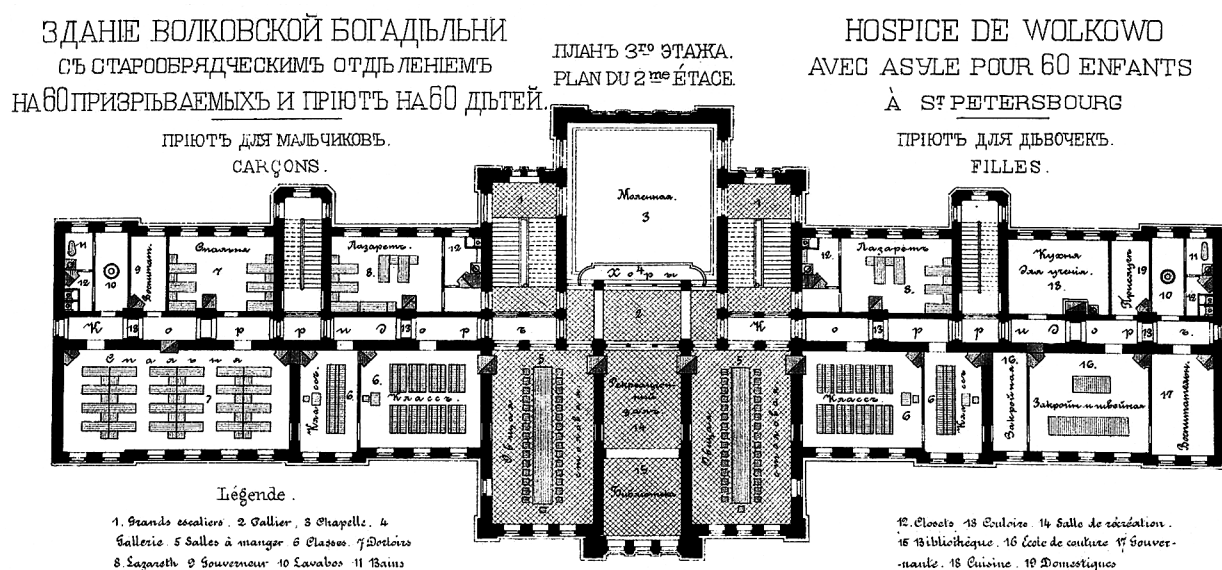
The building of the Volkovskaya almshouse. 3rd floor plan [9]
